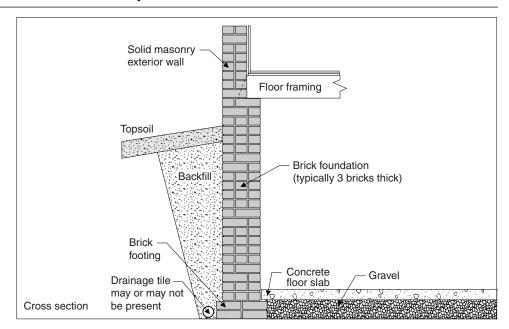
Brick Foundation with Masonry Exterior Walls
